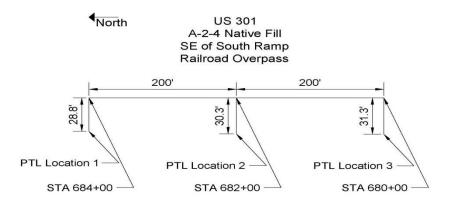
Project Site #2 US-301 - East service road test site location sketch
